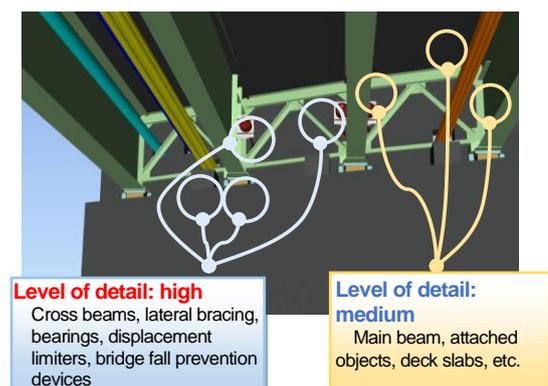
Setting the Level of Detail for a 3D Model around Girder Ends
